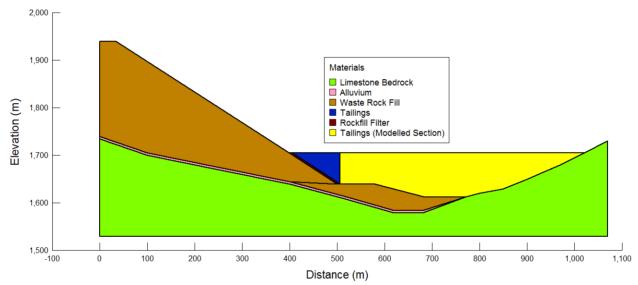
WFTF layer geometries and modelled SEEP/W section.
